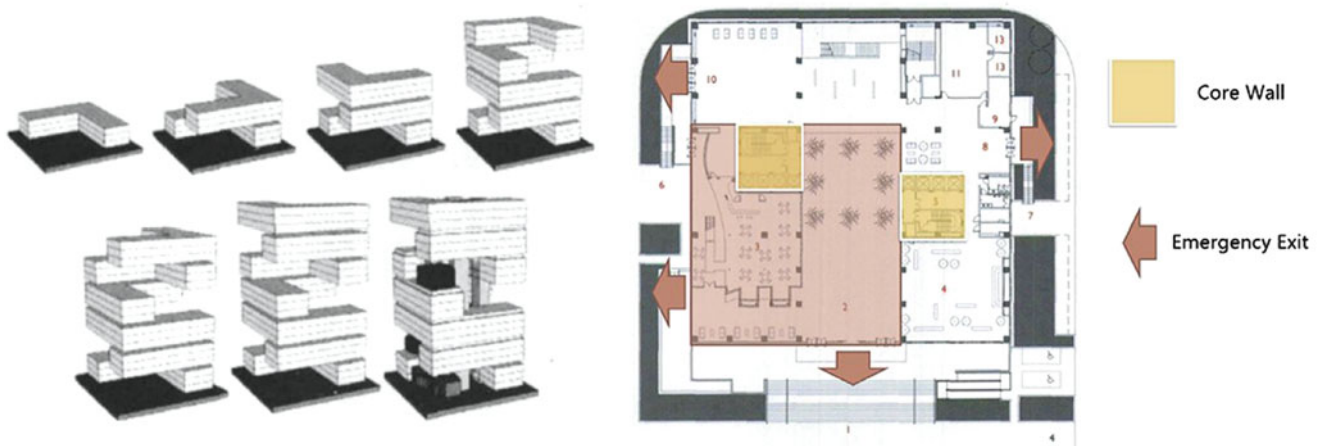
Spiral vertical layout of the “L” shape units and plan view of the lobby
